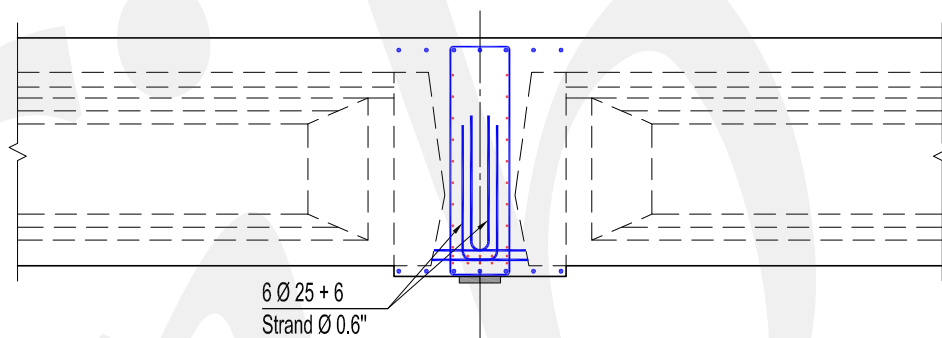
Continuity detail over the pier. Note: 1" = 1 in. = 25.4 mm.
